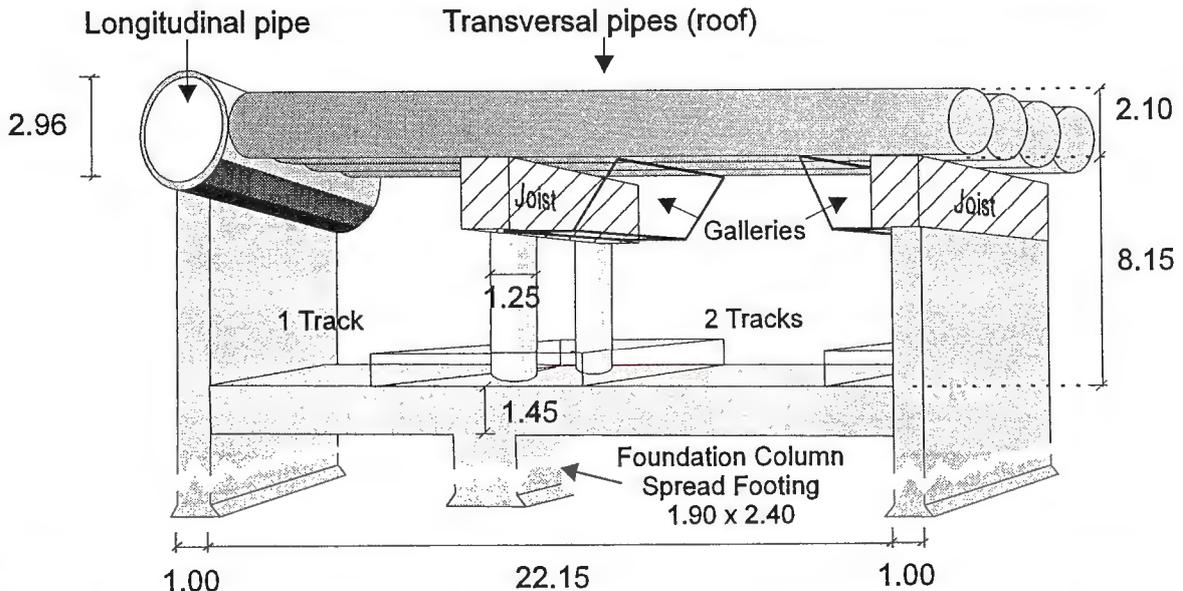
Schematic view of the longitudinal and transversal pipes in the tunnel section C (all measures in metre).
